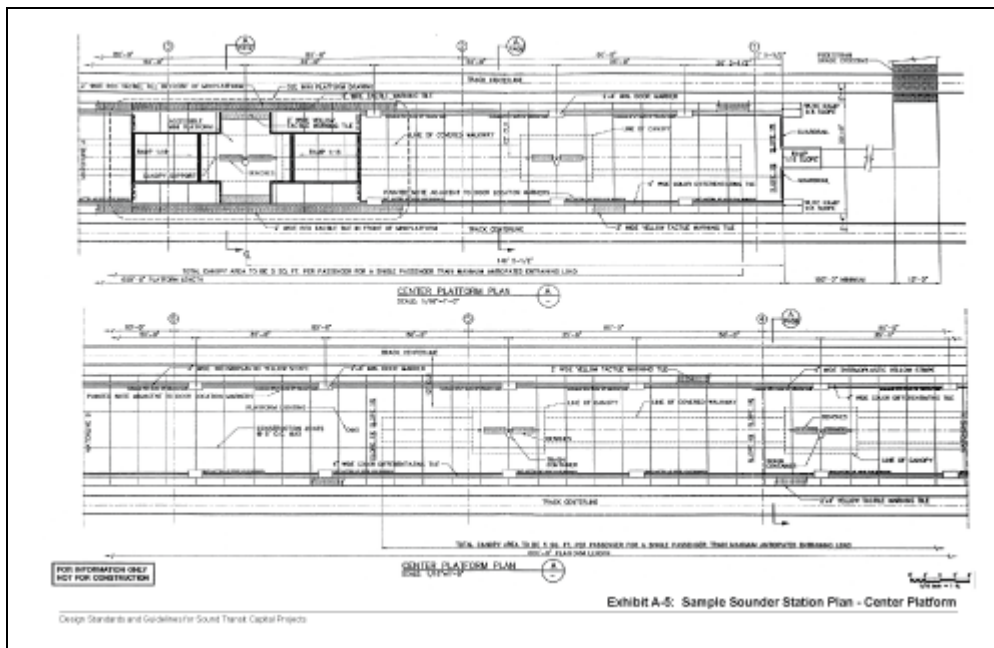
Sample Sounder Station Plan – Center Platform (1.8 MB)
